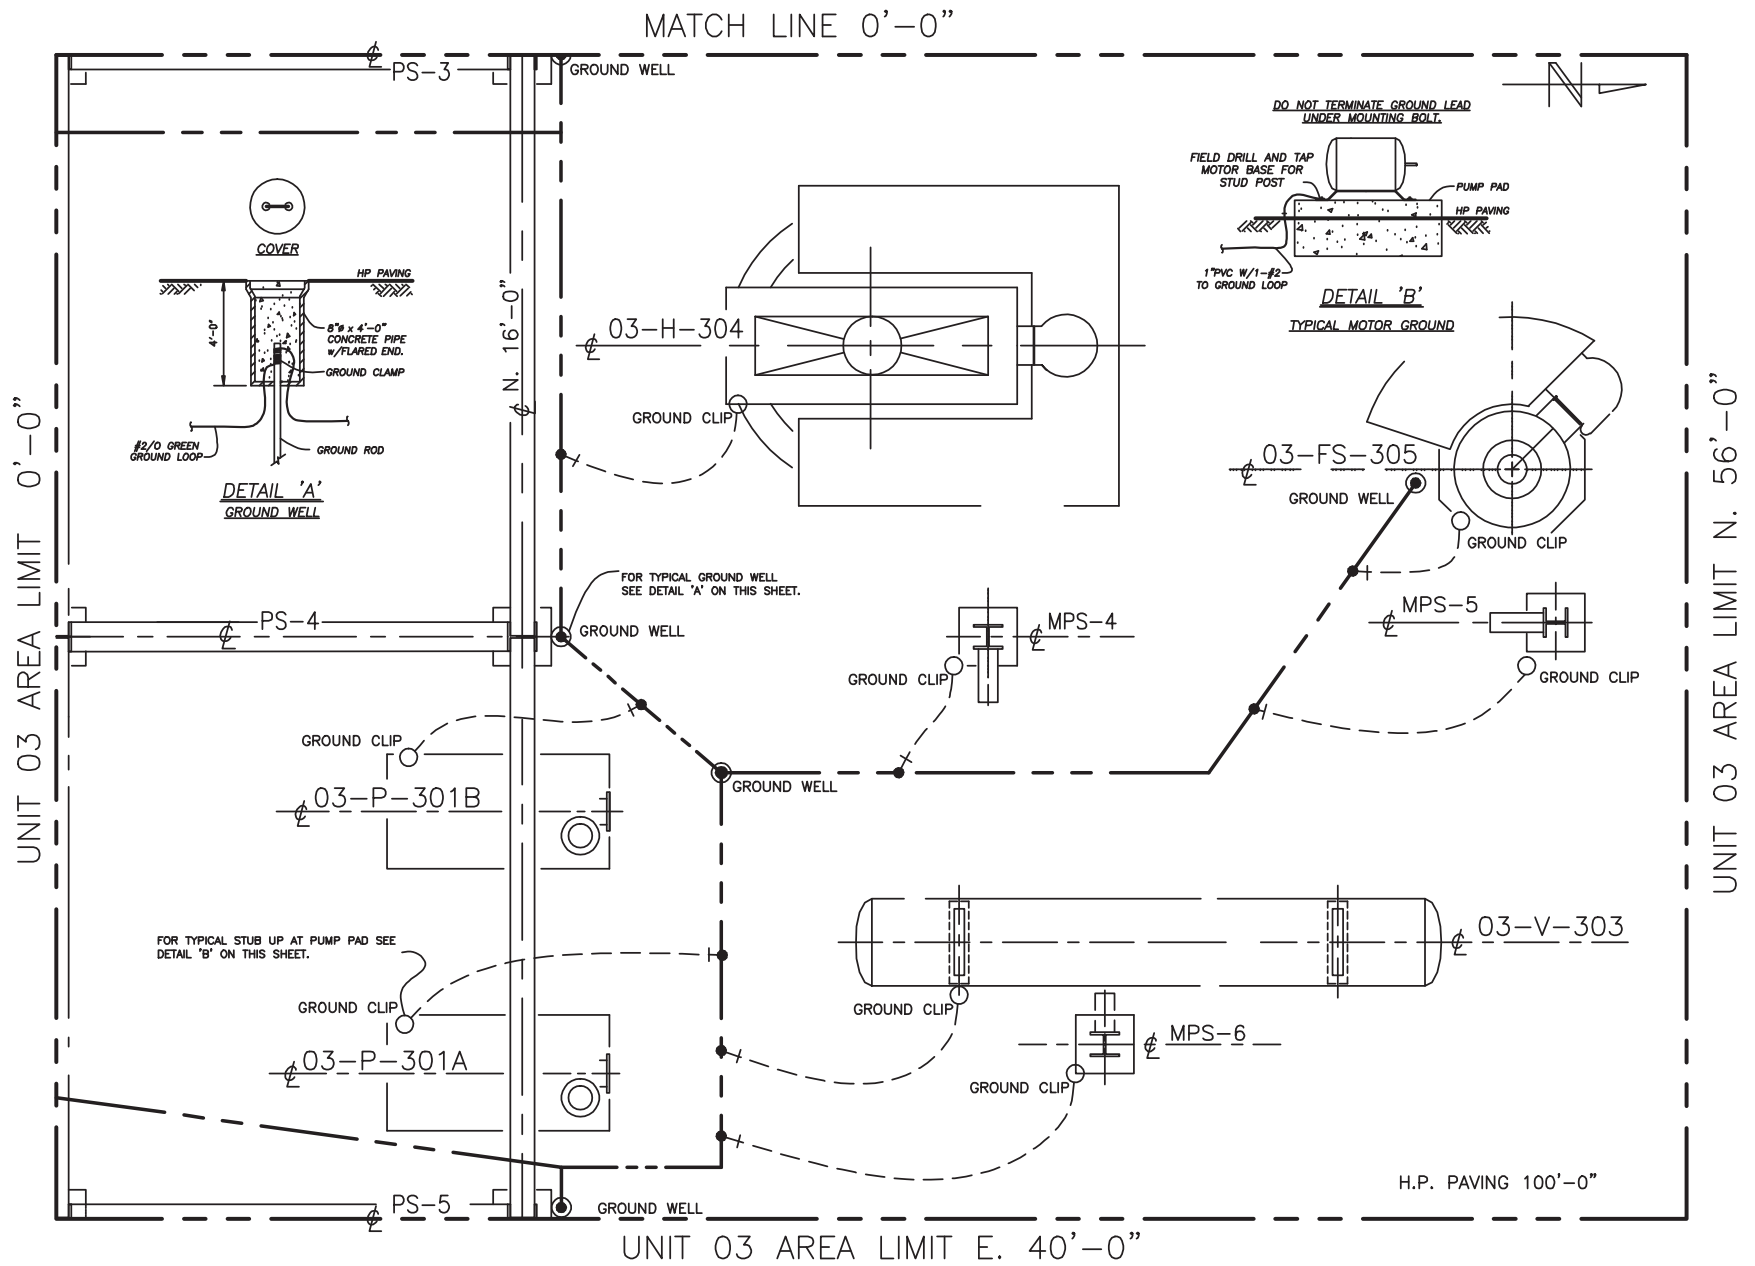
Unit-03: Electrical: Grounding Plan.
